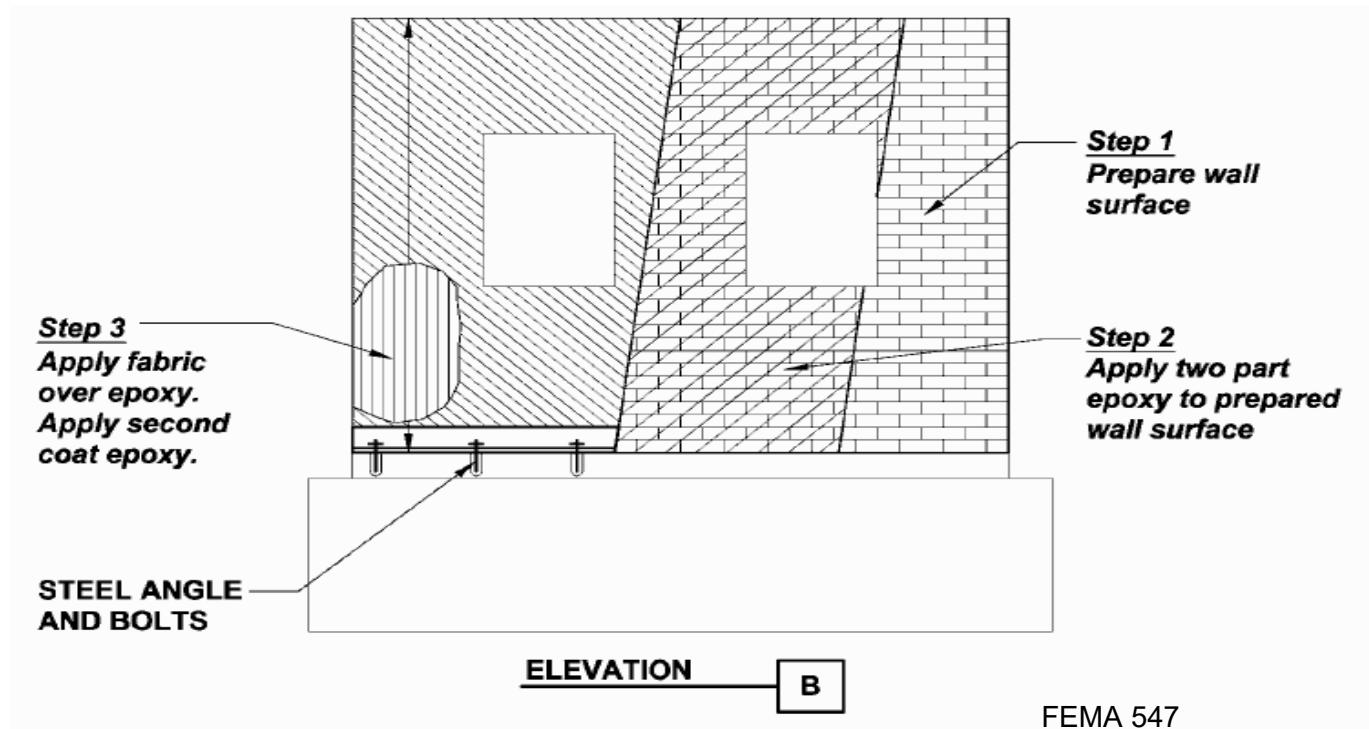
Fiber Composite Wall Overlay on URM Wall
